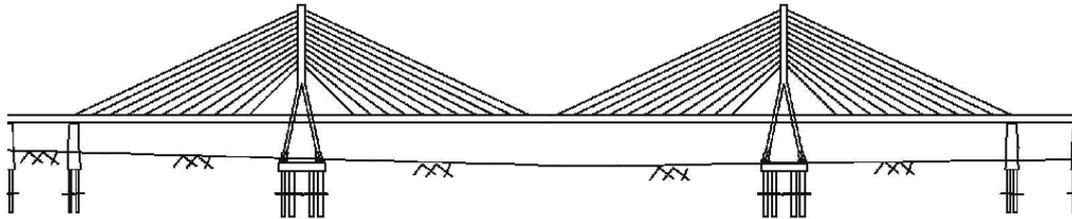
The cable-stayed bridge consists of two towers, eleven pairs of cables on each cable plane and the main girder (Song et al., 2007).
